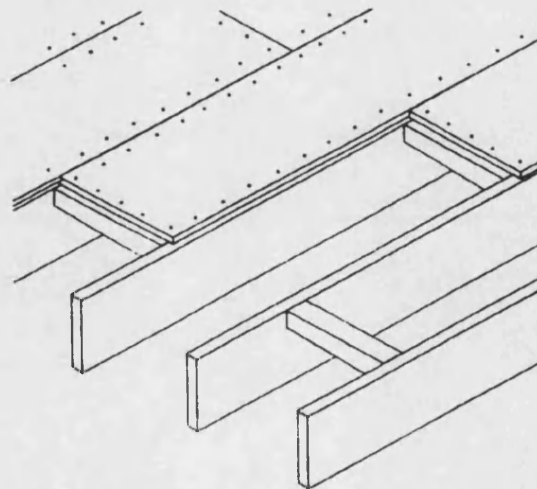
Tongued and grooved edge structural decking - this should be laid across the joists with the short edges supported (WPPF Ref AD/15, 1994).
